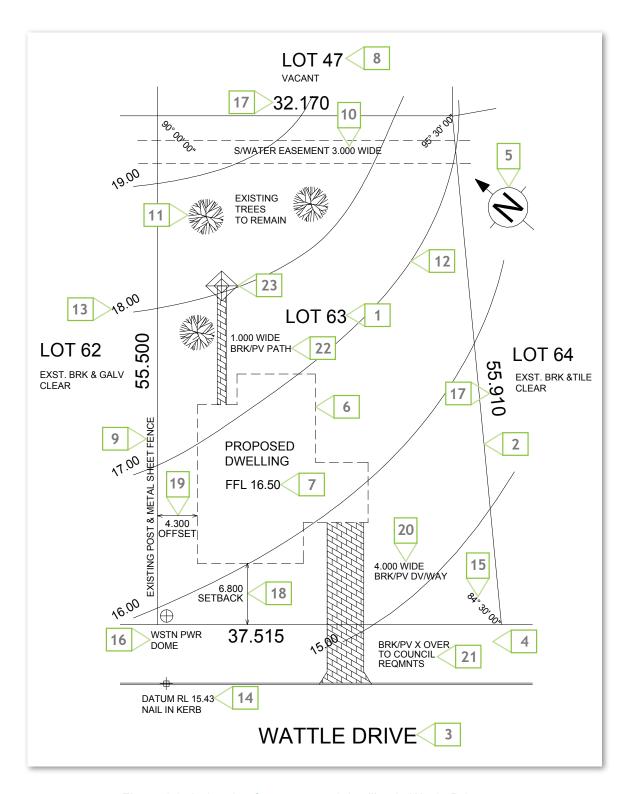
A site plan for a proposed dwelling in Wattle Drive.
